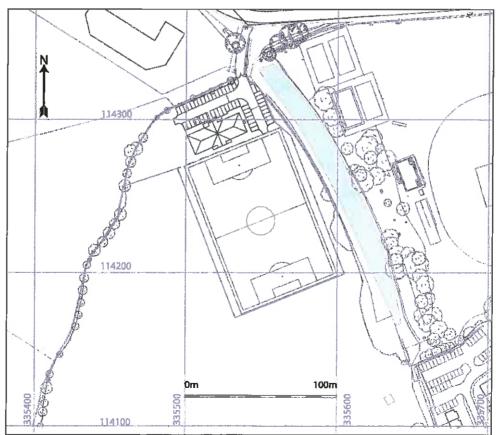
The new football pitch and club house are outlined in red. The blue shows an intact length of the Chard to Taunton Canal. Plan courtesy of Paul Rowe Architectural Services.
